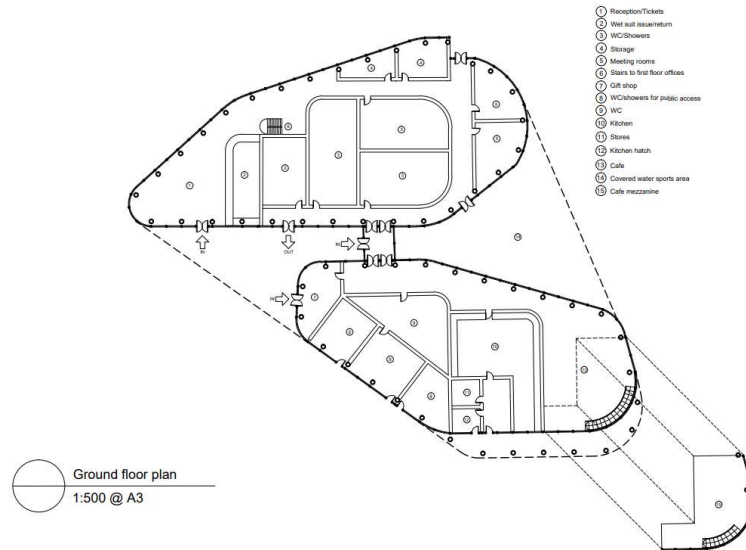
Ground Floor Plan of Proposed Watersports Facility and Cafe
